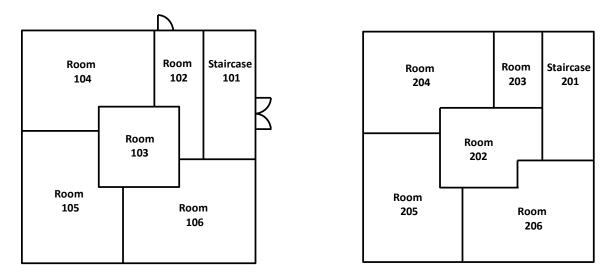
Flexible Research Platform #2 Floorplan, first floor (left) and second floor (right)
